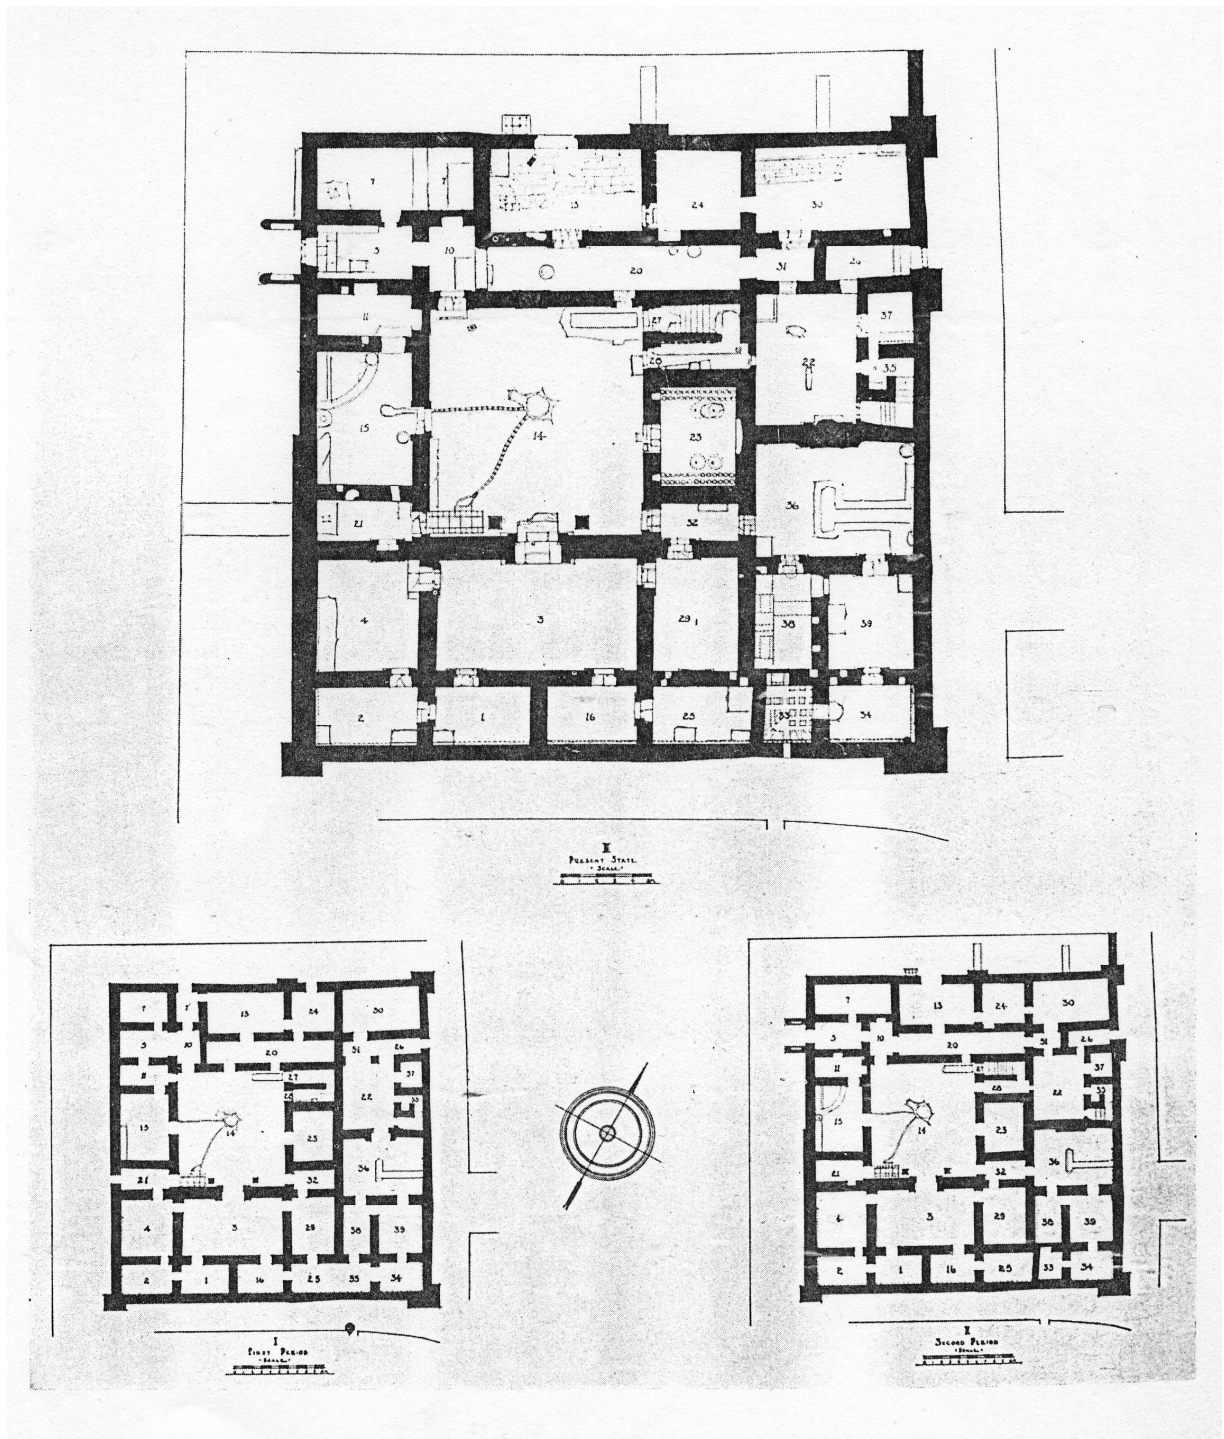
Plan of house #379 from Dura Europos showing typical location of cistern in courtyard [Hopkins 1936, plan II].
